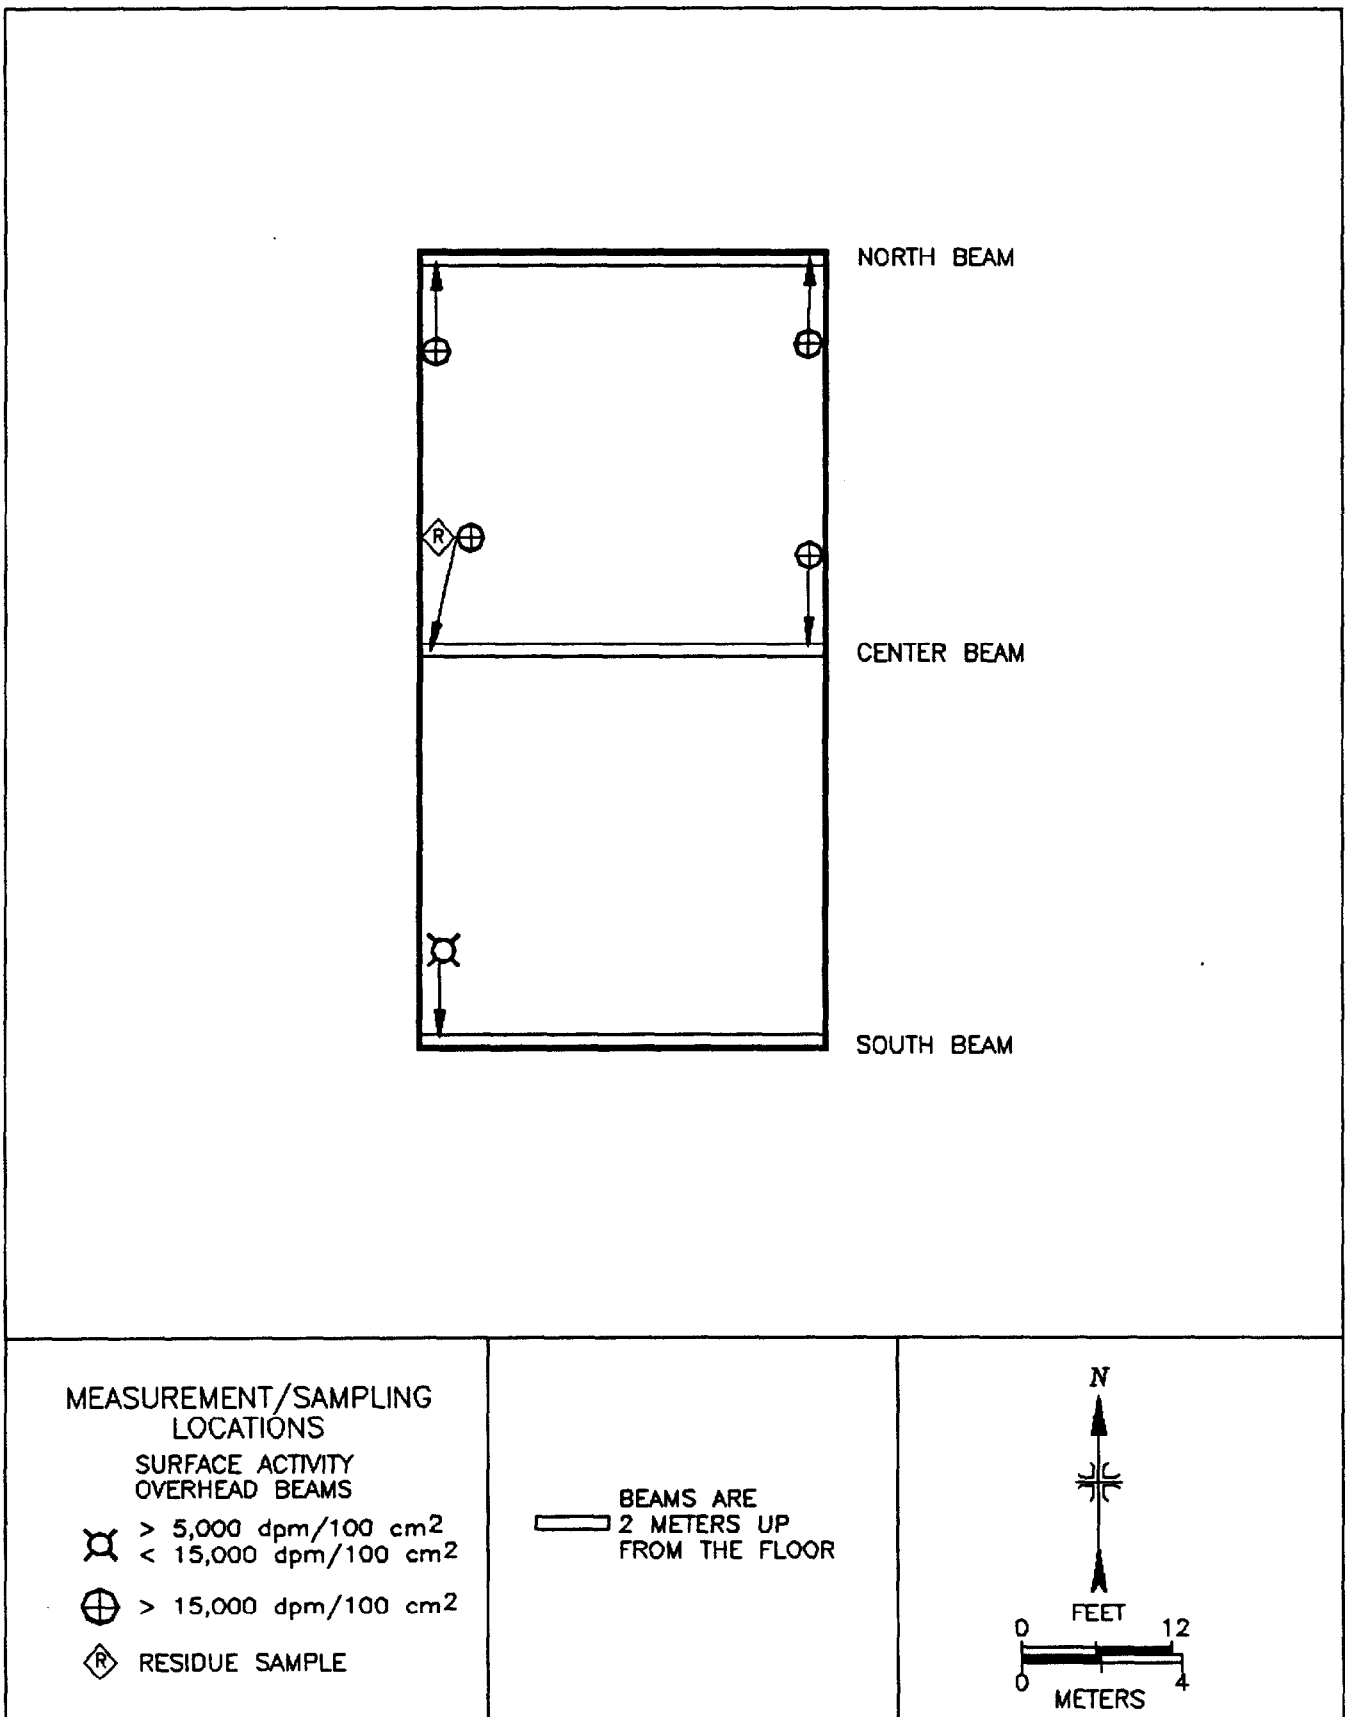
Mezzanine, Overhead Beams – Measurement and Sampling Locations
